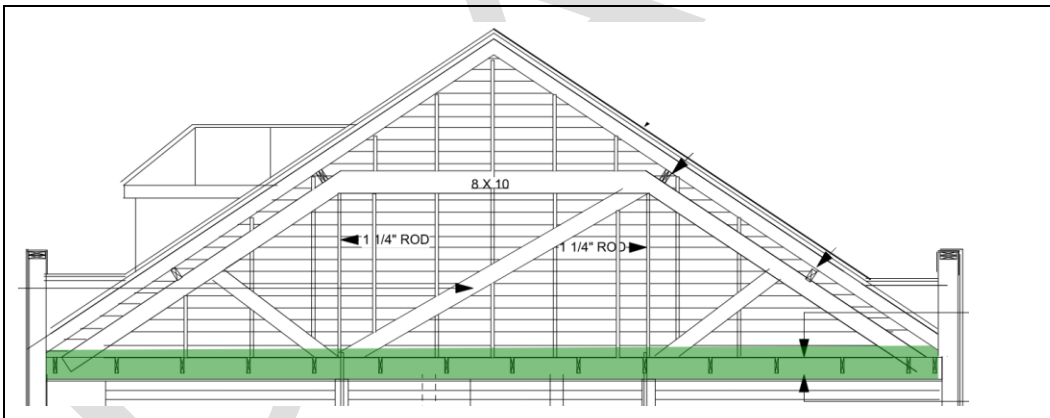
Example of an interior insulated roof approach, with the plane of the insulation shaded green on a partial section drawing of the roof (drawing underlay source: Keay Architecture Ltd.).
